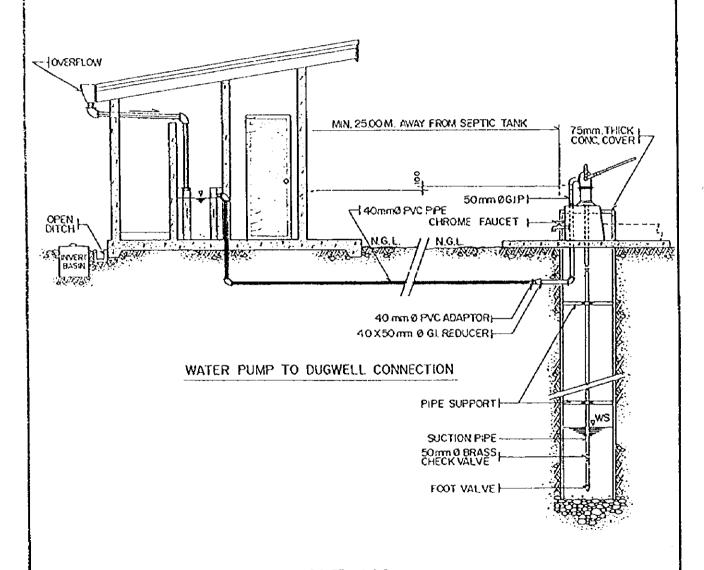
STANDARD STRUCTURE OF SCHOOL TOILET FACILITY
